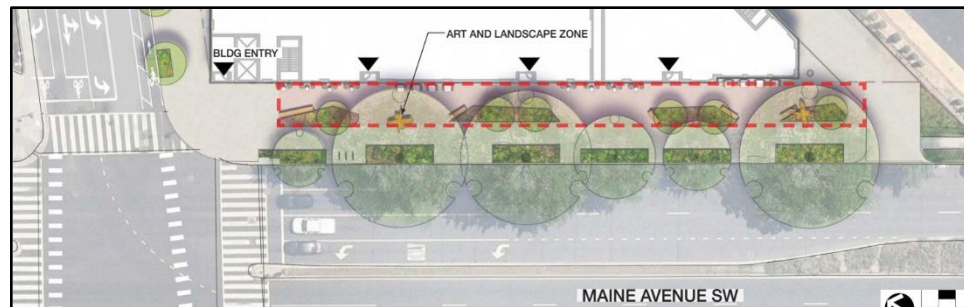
A5 – Sheets 66, 72 - Portions of Streetscape Plan
